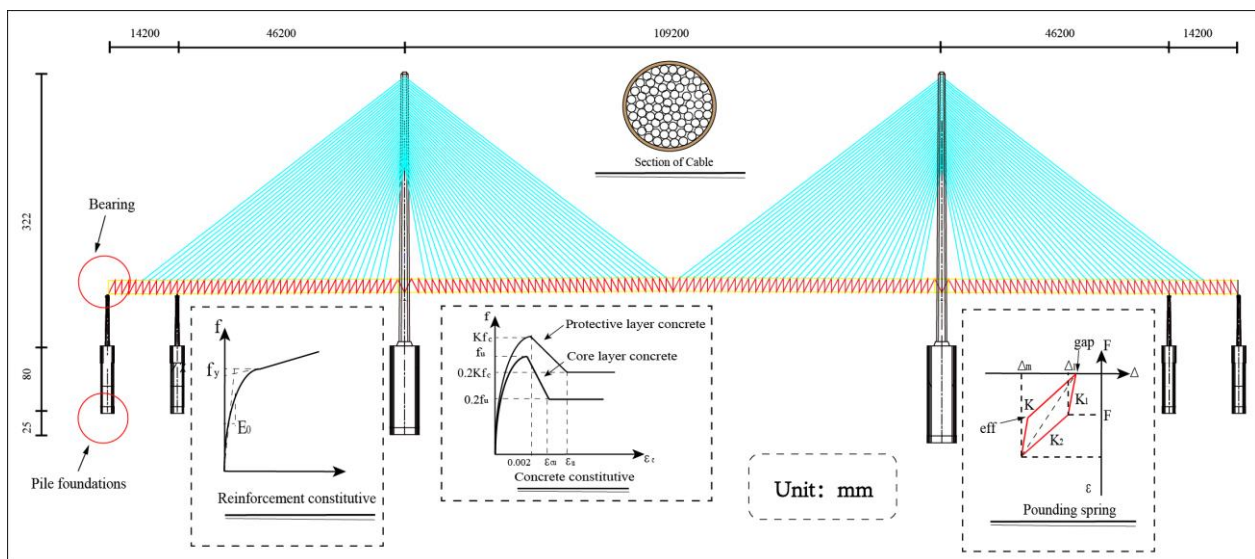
The overall layout diagram of the cable-stayed bridge (unit: mm).
